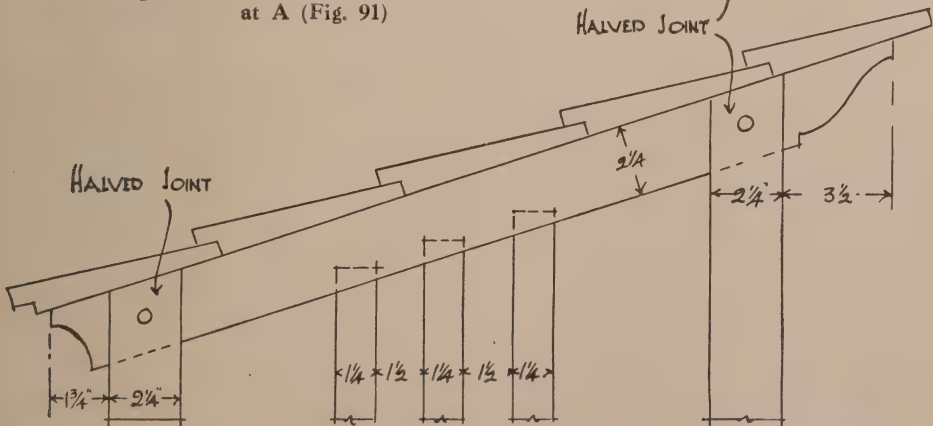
Detail Elevation of Hood of Seat at A (Fig. 91)
